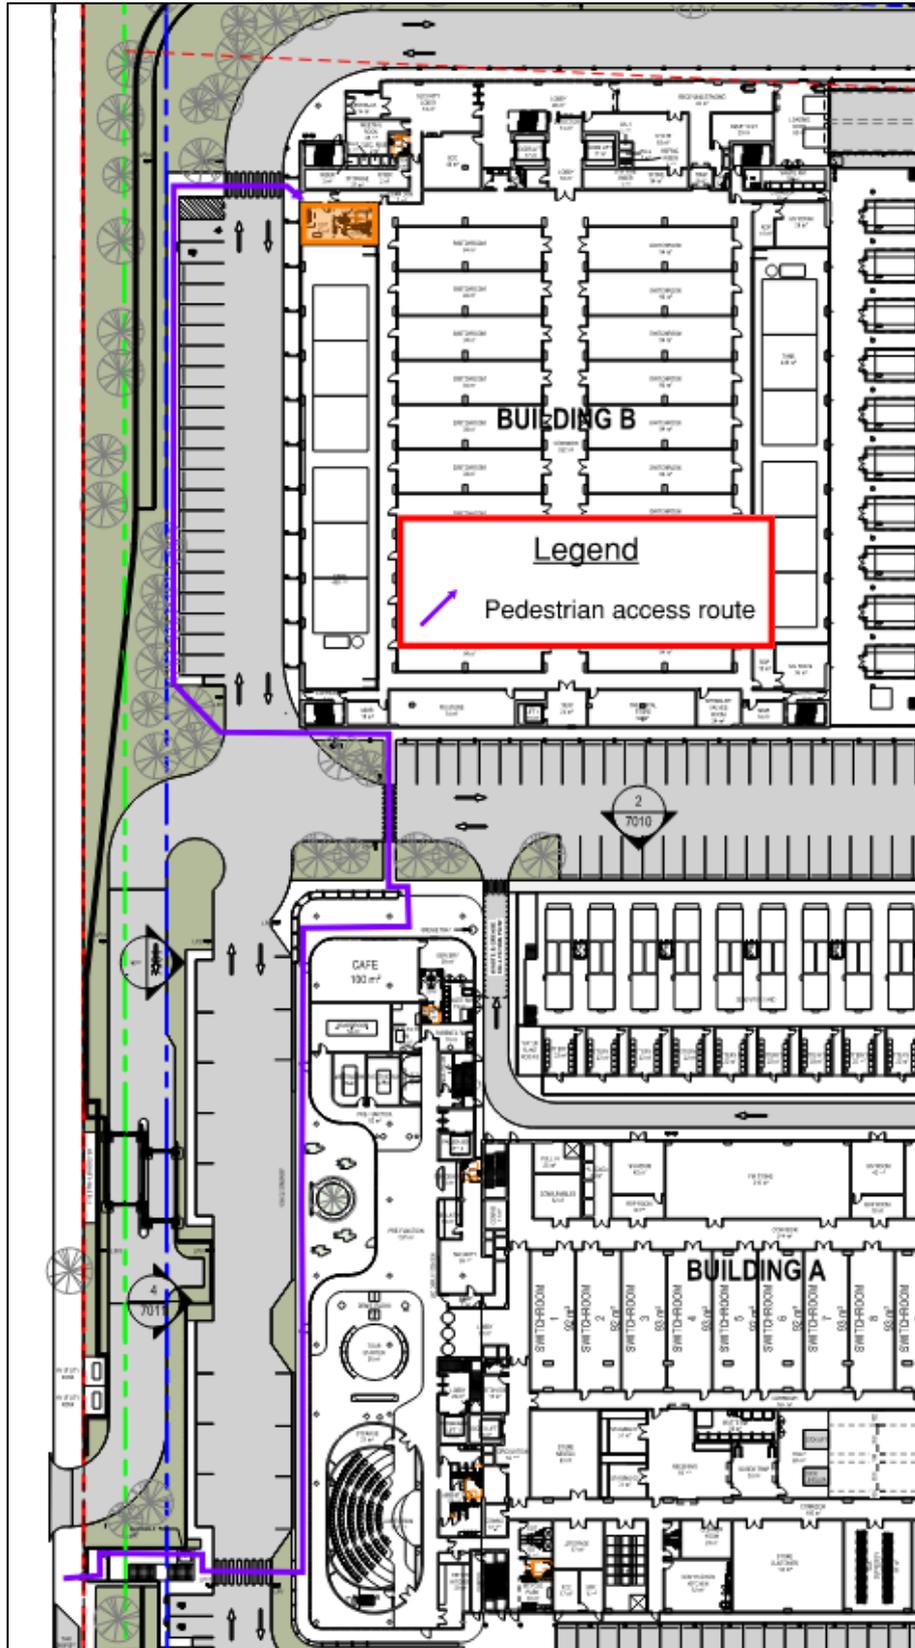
Building B – Proposed End of Trip Facilities and Pedestrian Access
